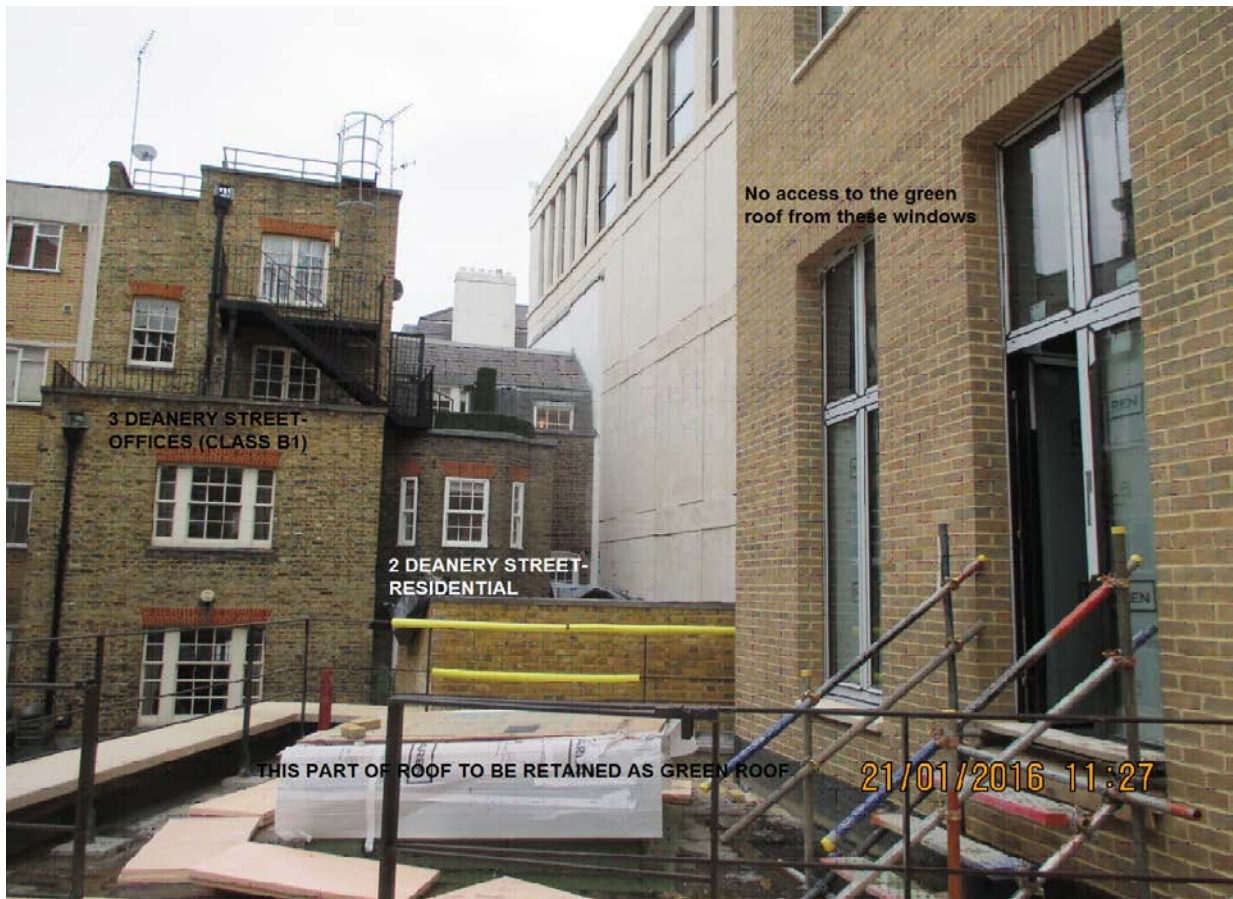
View toward rear of building when viewed from entrance to Deanery Mews
